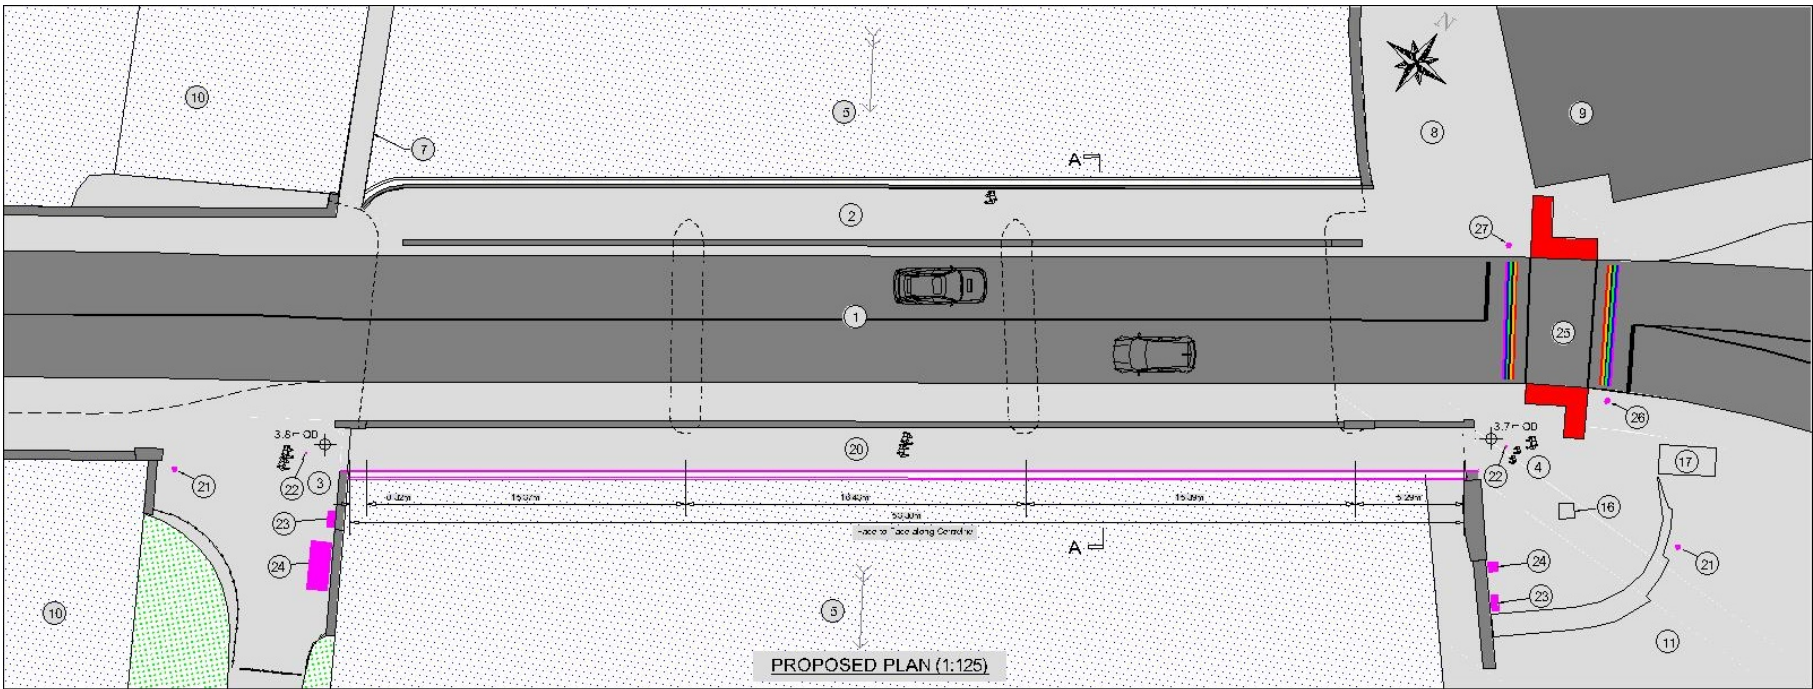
PROPOSED FOOTBRIDGE (PINK).
